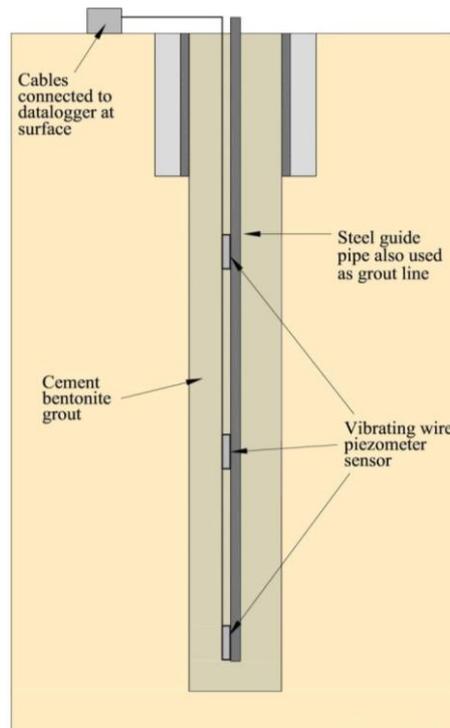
Grouted-in multi-level vibrating wire piezometer installation (source: LOP project)
